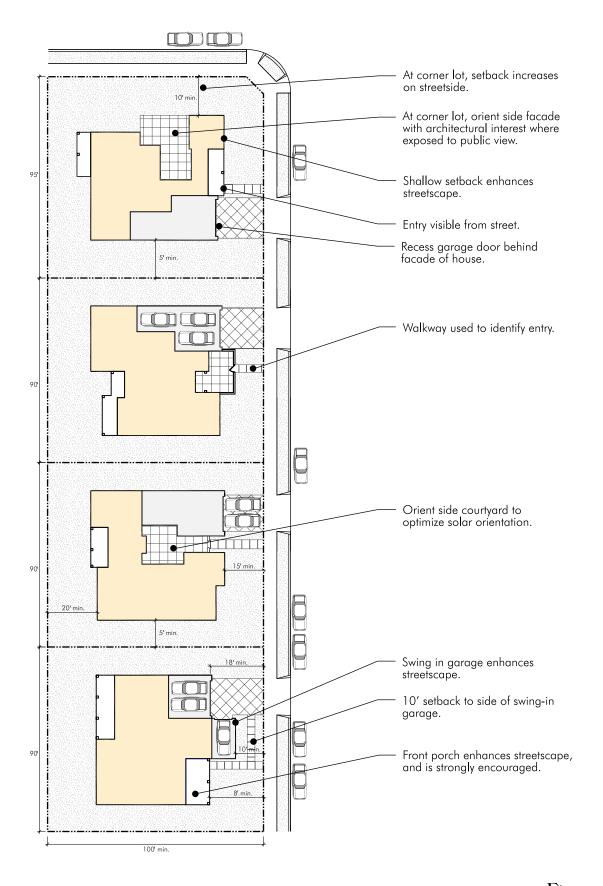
Typical 9,000 Square Foot Lot Layout
